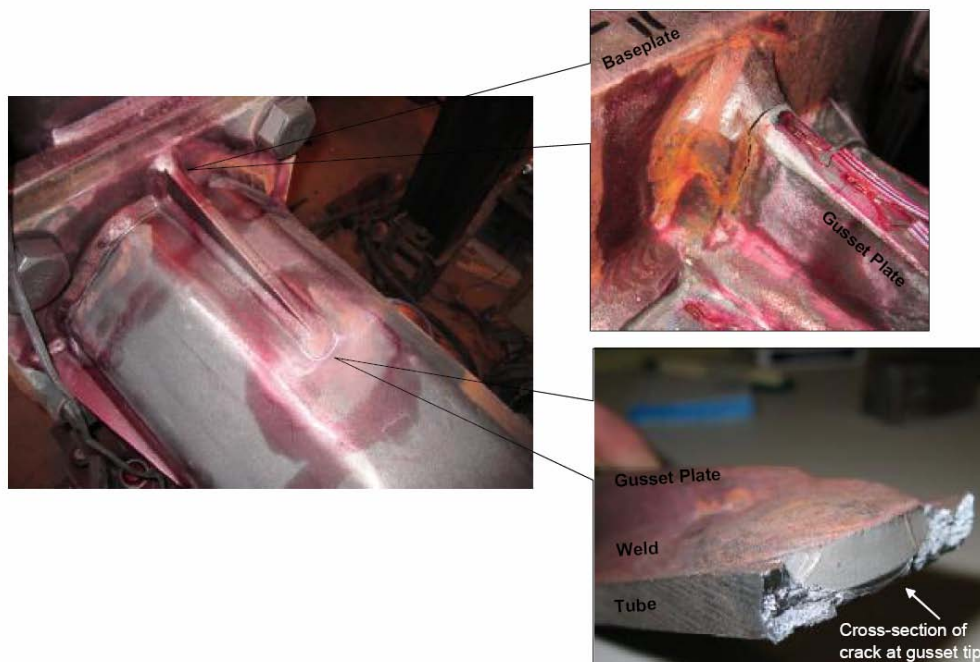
Typical Crack Formation and Configuration Seen in Testing of Gusset Plate Stiffened Mast-Arm to Plate Connection Details (Ocel *et al* 2006).
